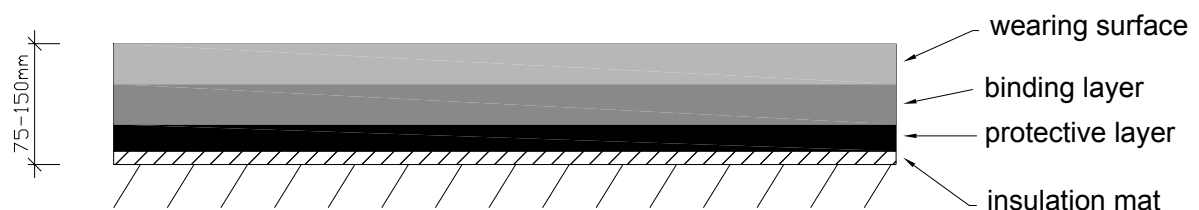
Configuration of asphalt pavement on concrete bridges for vehicle traffic (Anna Pousette, 1997)
